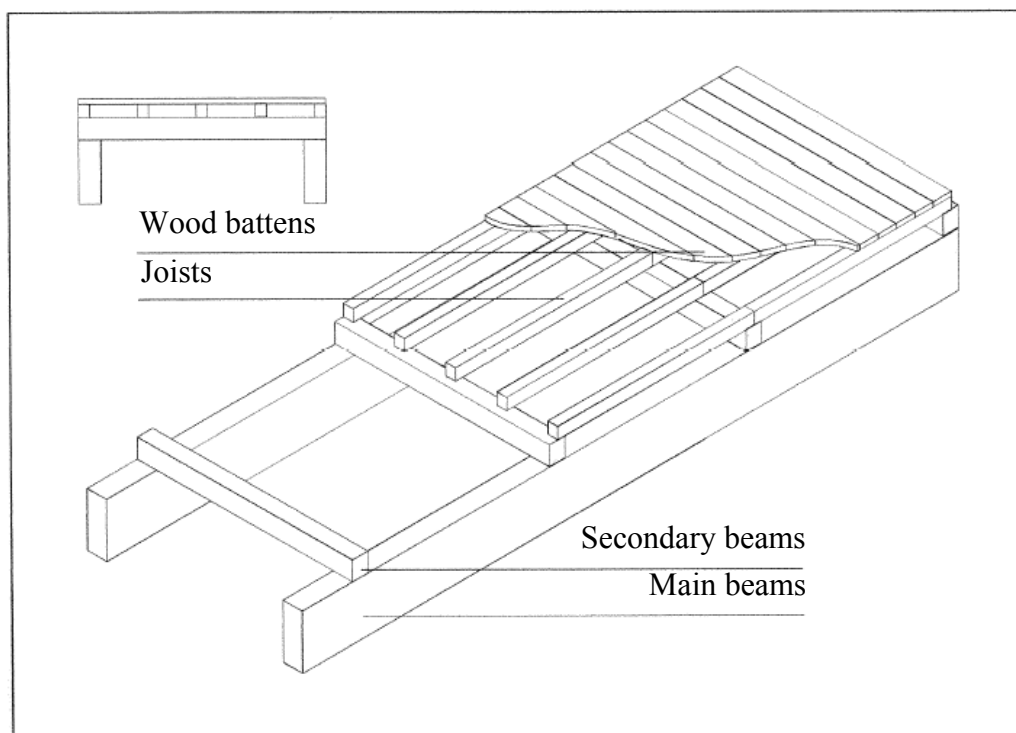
Example of a traditional batten deck used in timber bridges (Bellumat, 2000)
